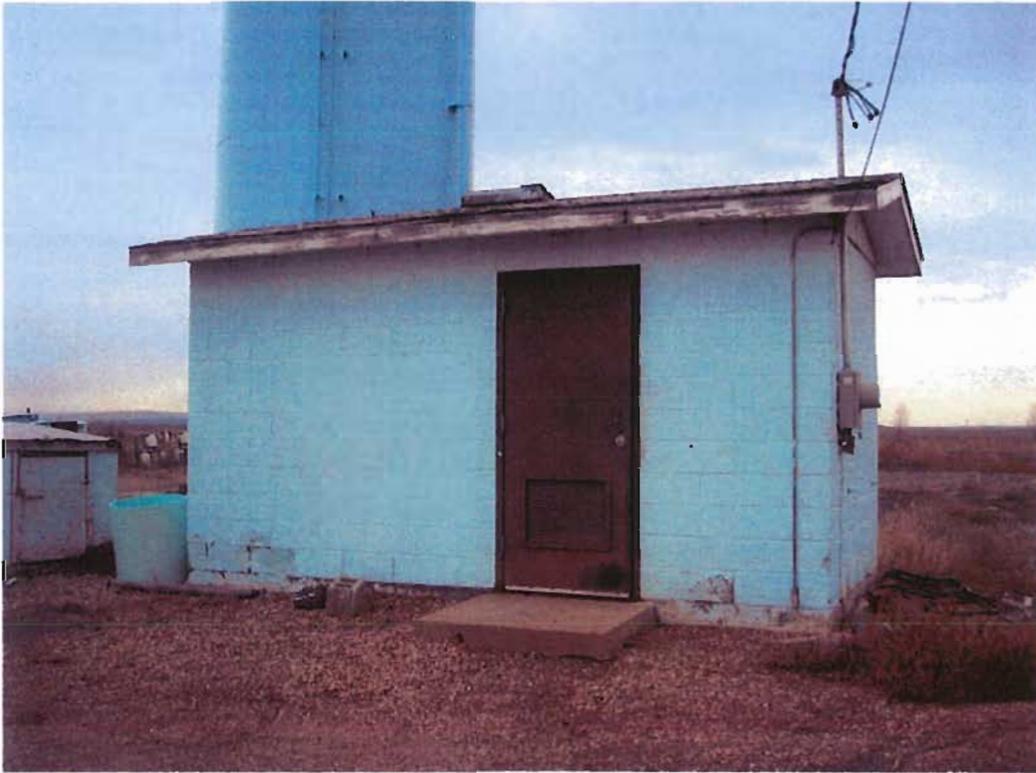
(facing northeast) – Existing municipal well house and storage tank on project site.
